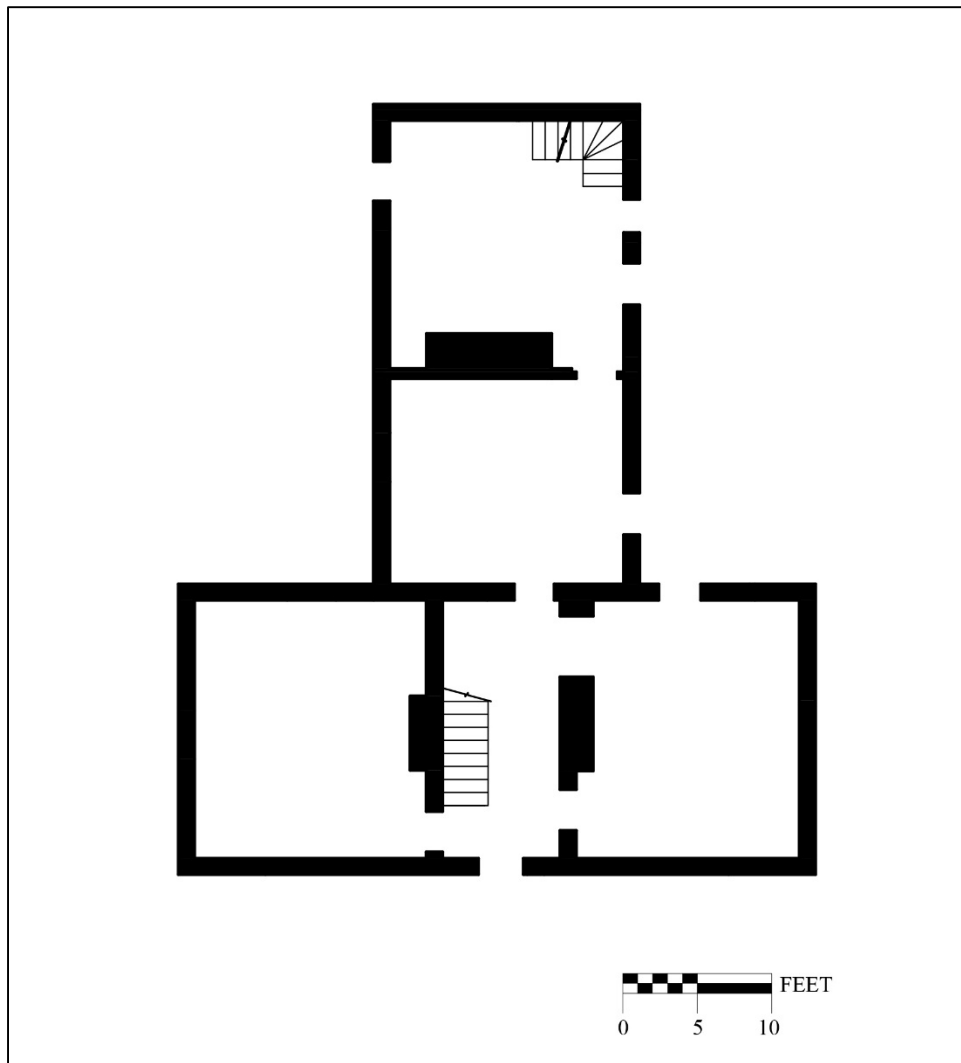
The Sensabaugh House, first floor plan. Author, 2017.
